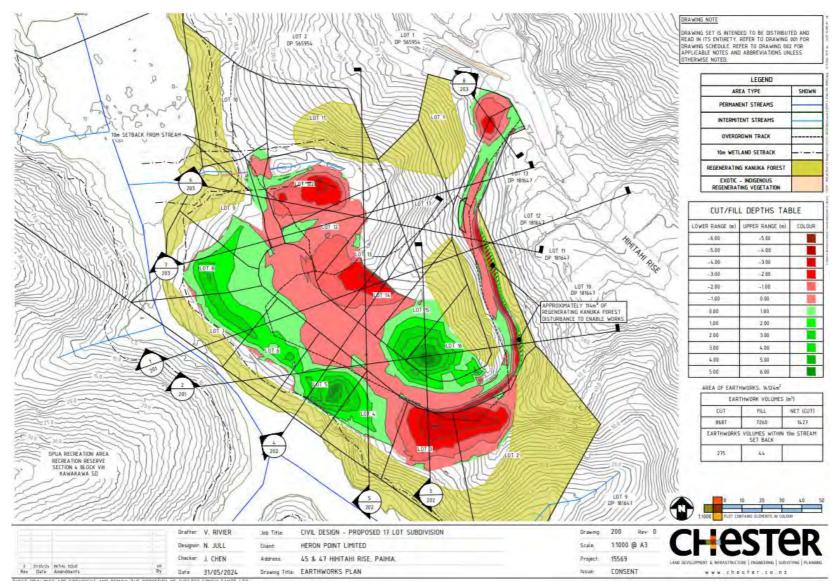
45 & 47 Hihitahi Rise, Paihia – Earthworks Plan
